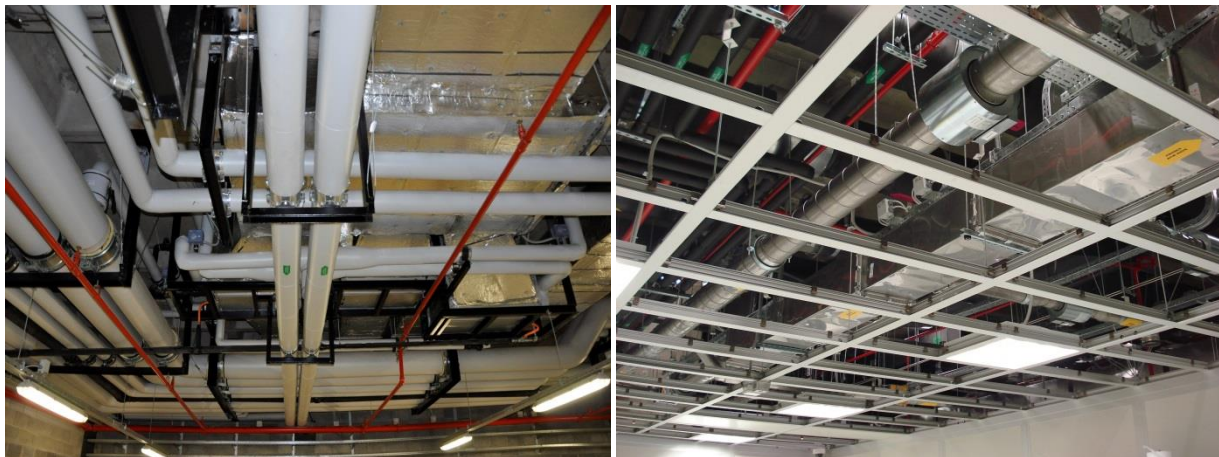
Typical ductwork in Mechanical mezzanine and CR areas.
